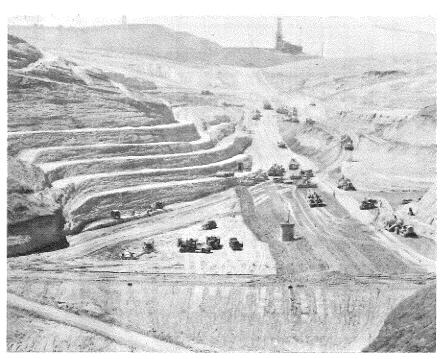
Looking upstream, showing benching on east abutment of main dam, Manhole A, 42-inch spillway pipe and catch basin on Elevation 340 berm.
